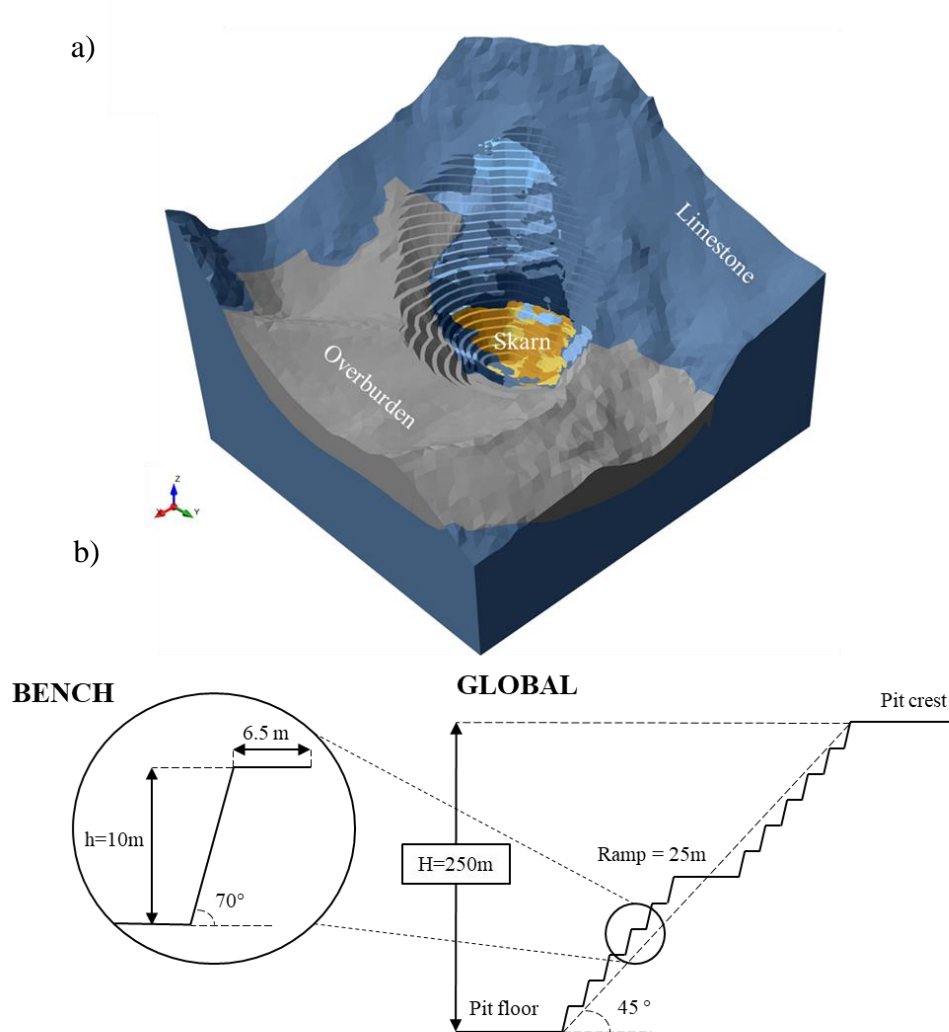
3D open pit model: a) Pit geology and b) Proposed open pit design
